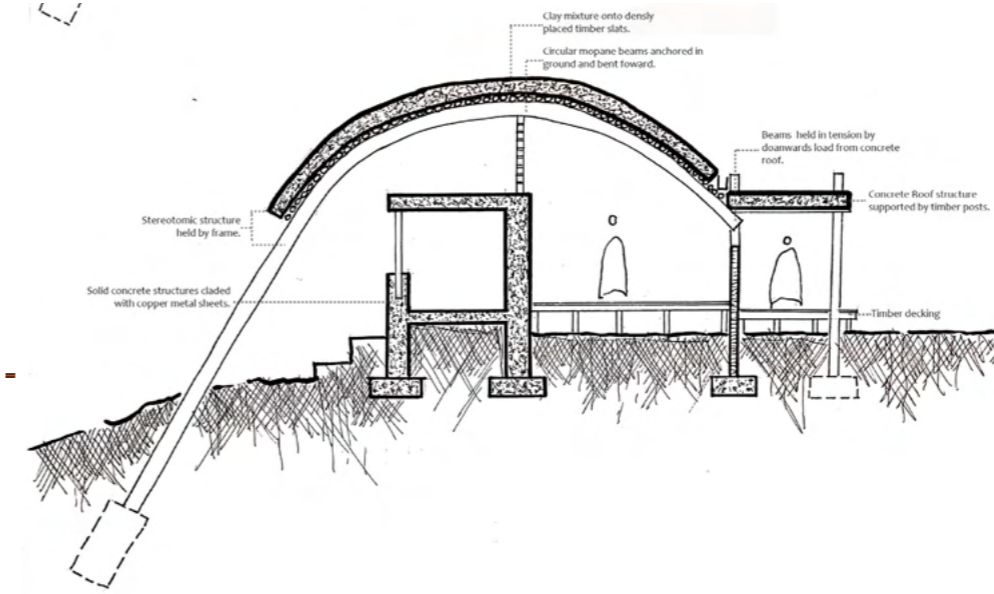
Ritual Pavilion roof exploration sketch (Author, 2021)
